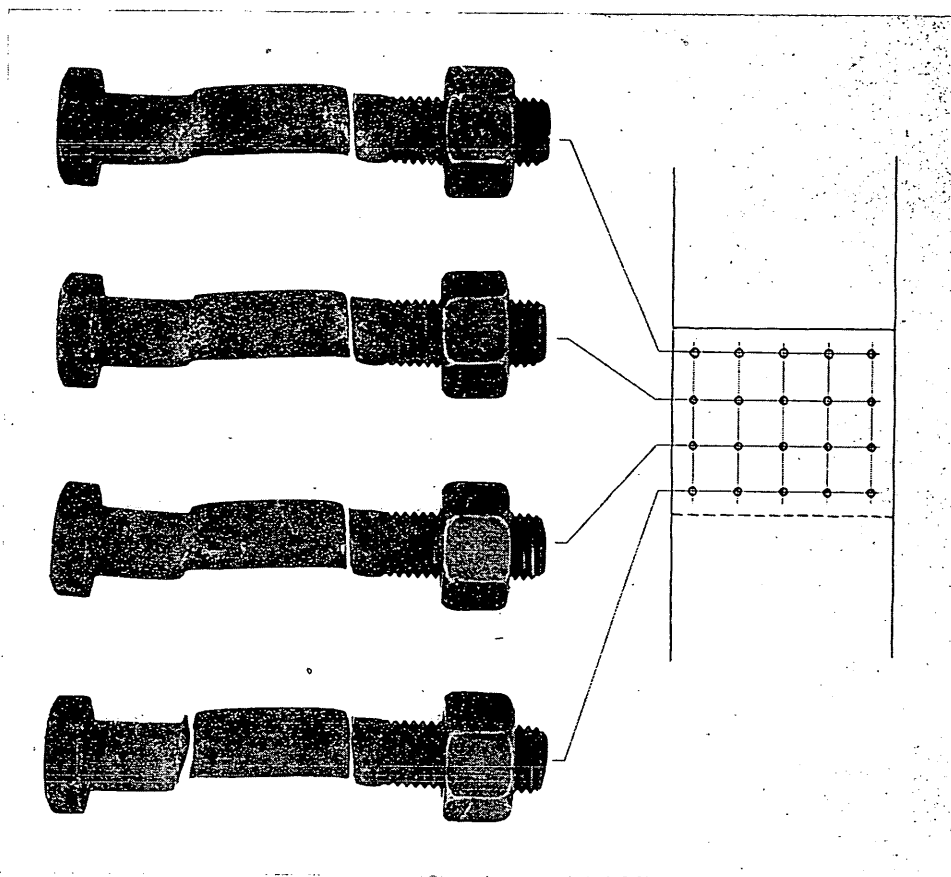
BOLT FAILURES OF JOINT B3
